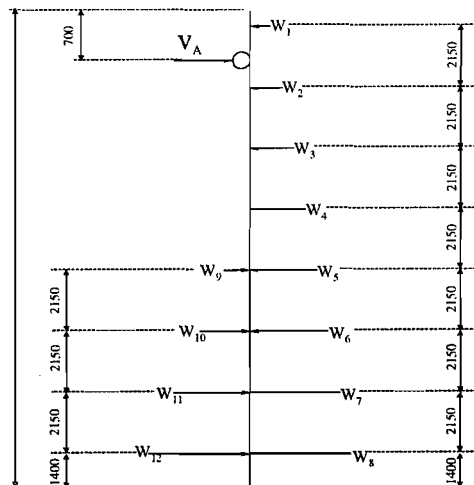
Dimensions of the full scale LX 25 mathematical test for a propped cantilever wall
